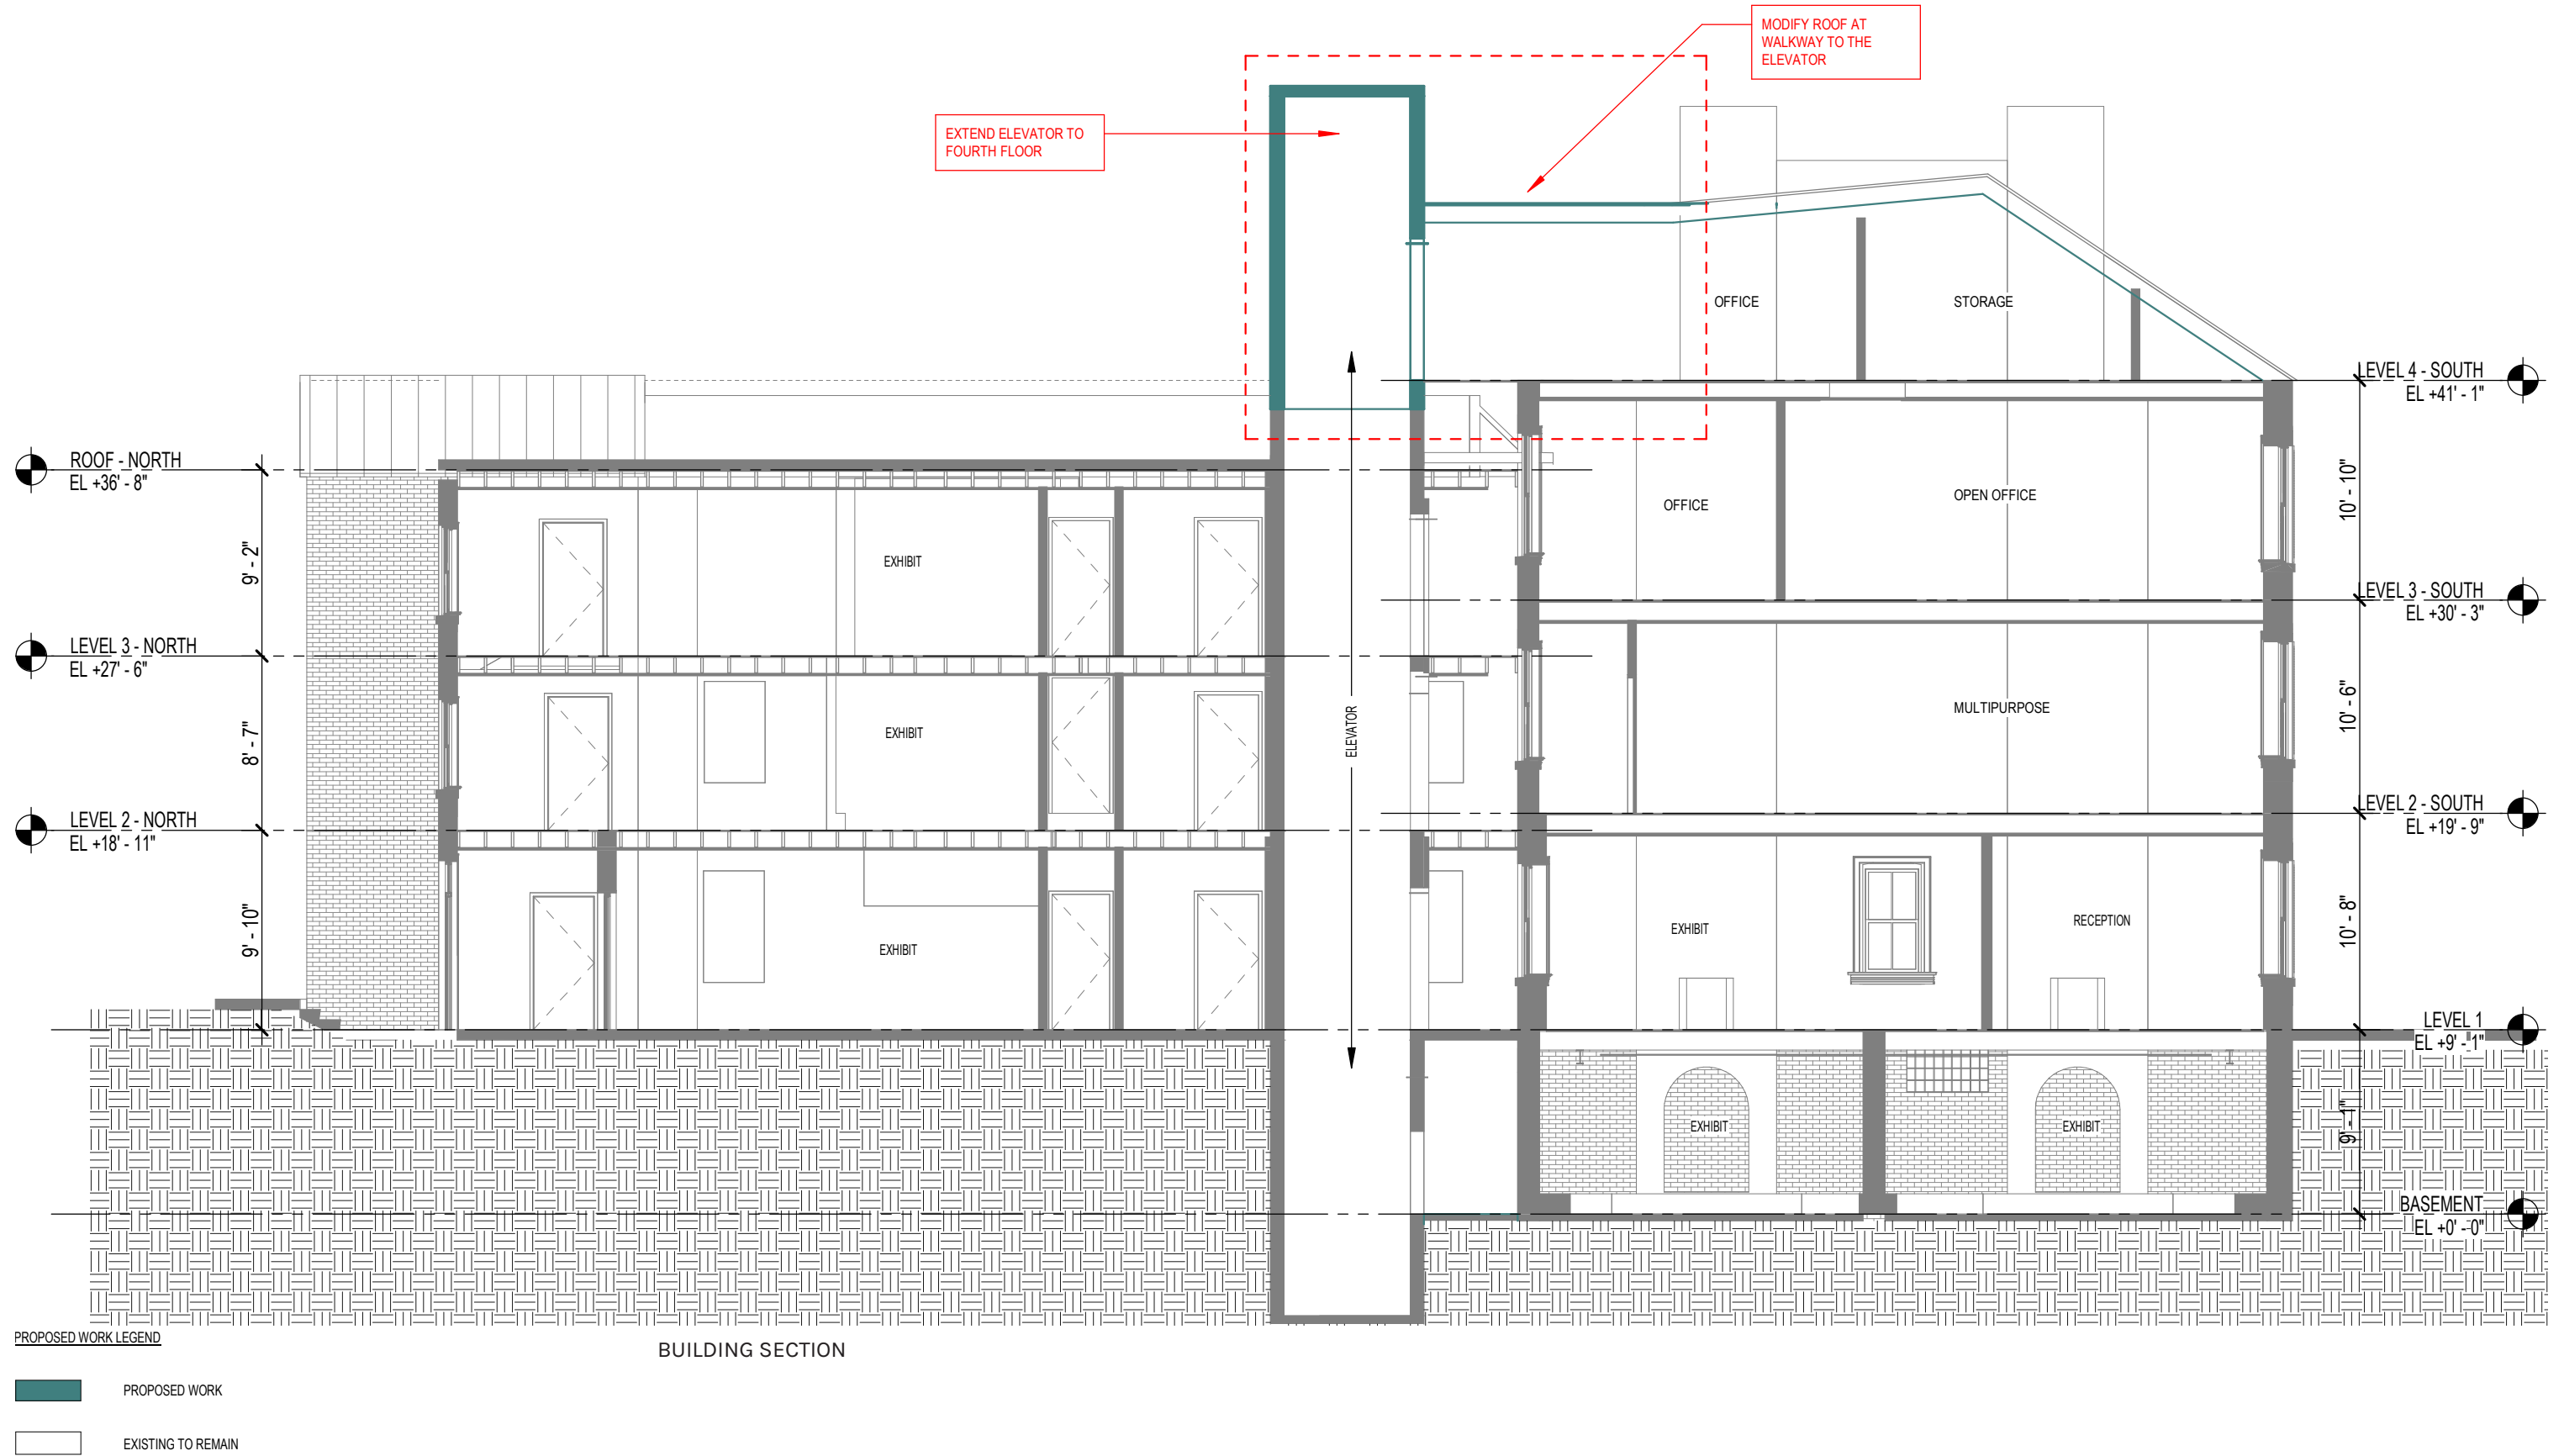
Phase 2 Option 4 - Highlights of Proposed Changes in Section to Extend Elevator to Fourth Floor
